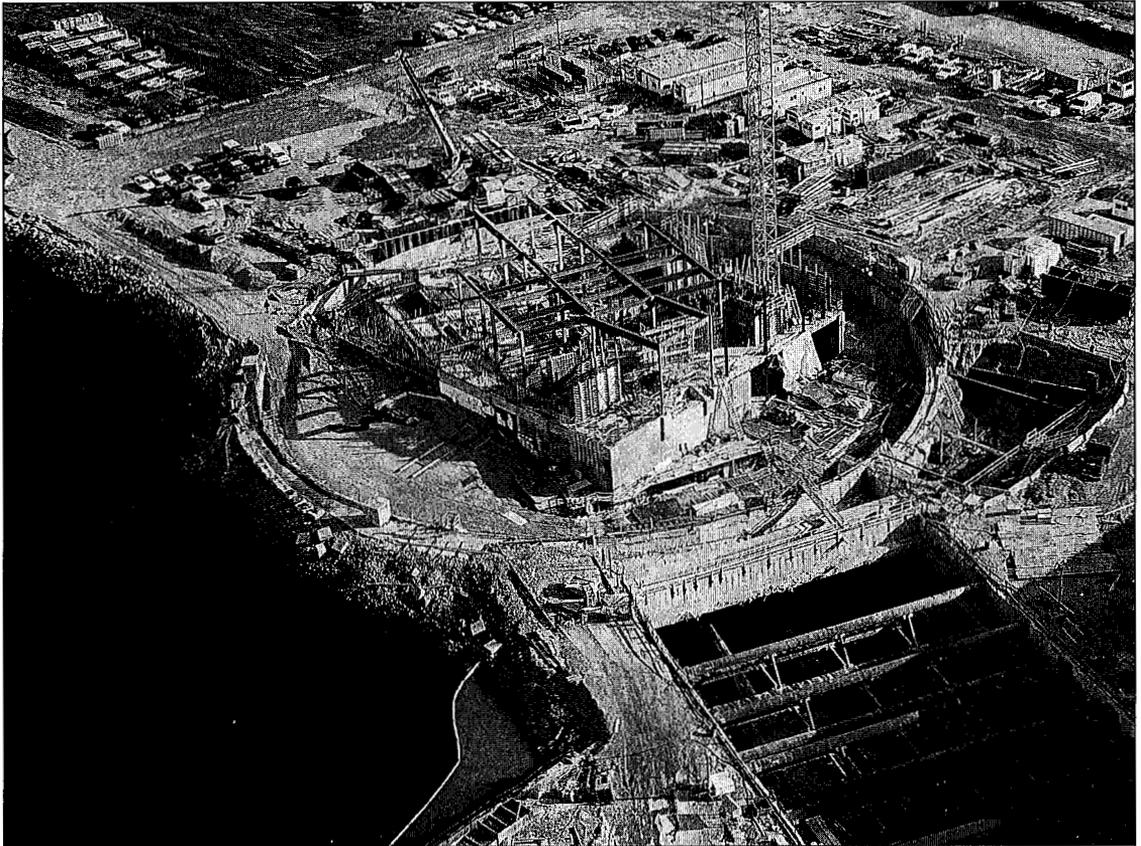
Construction of the ventilation building. The south opening and notch are in the foreground and to the right.
